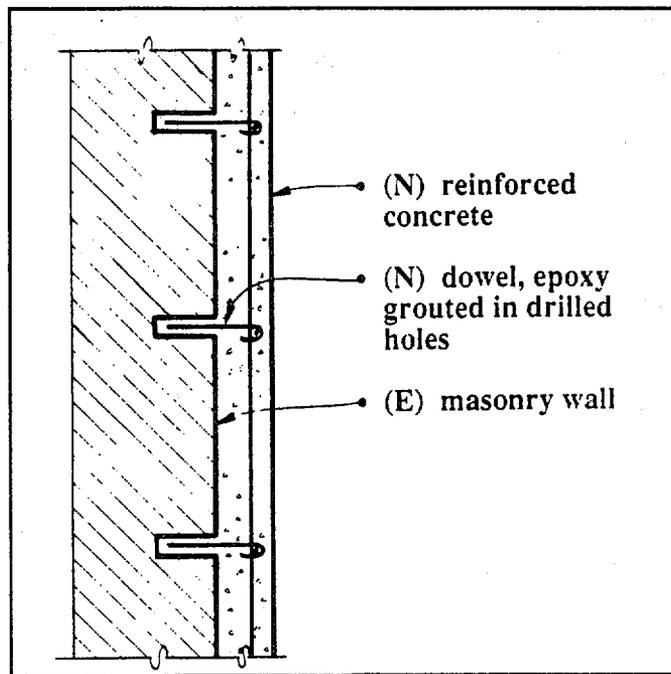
Strengthening an existing reinforced concrete or masonry wall.
